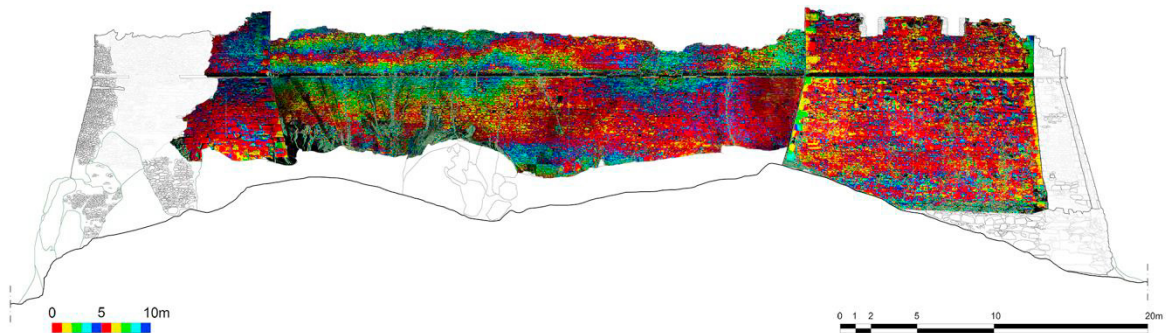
Elevation map of the West façade, useful to understand the wall's deformation
